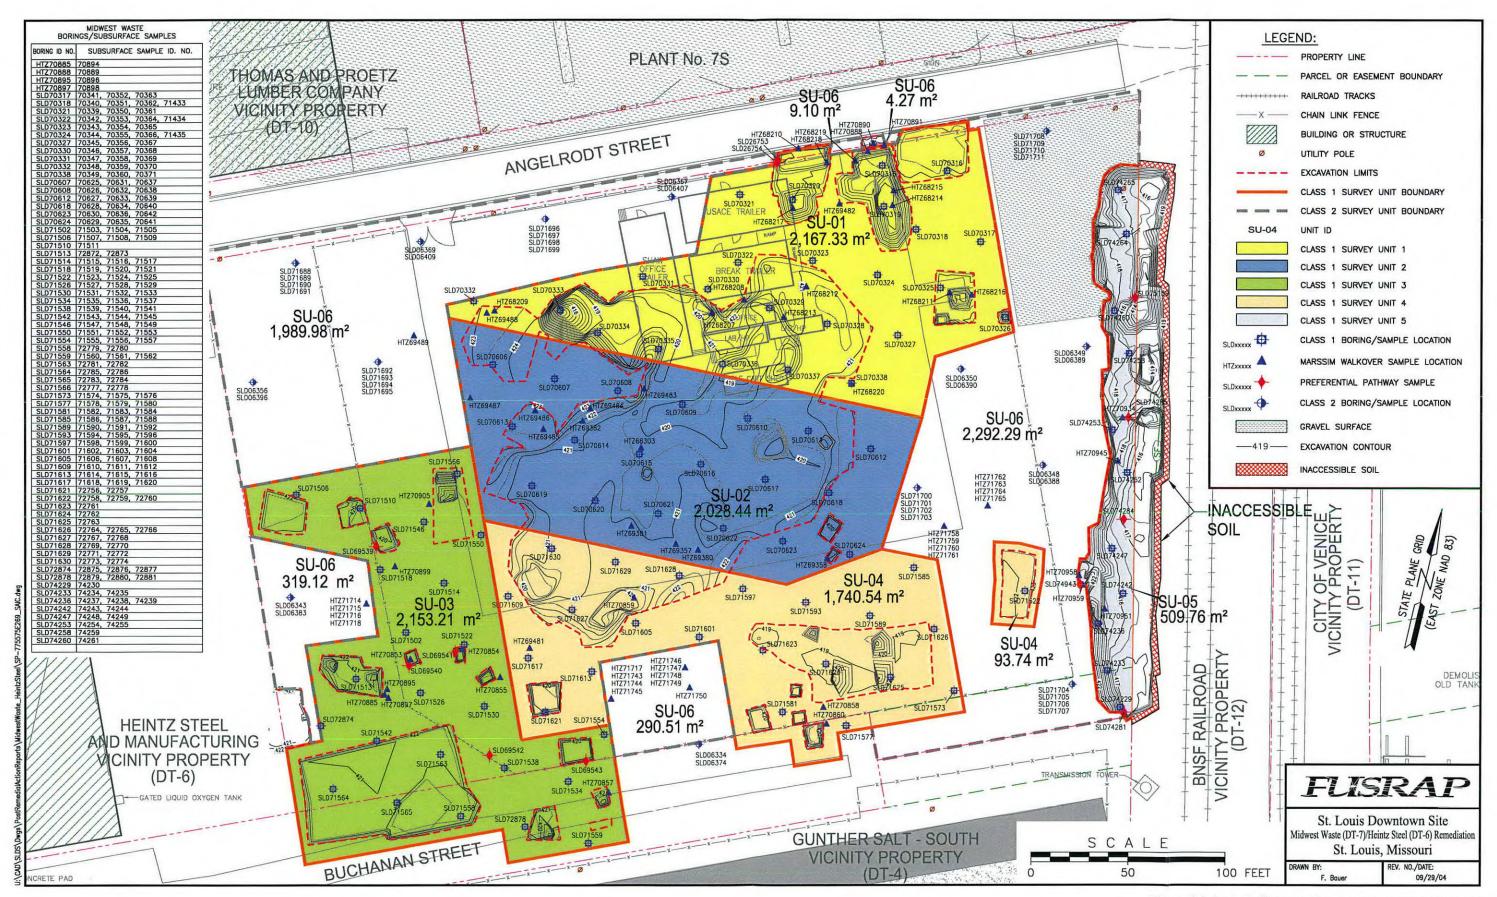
As Built Excavation Areas and Survey Units, DT-7
